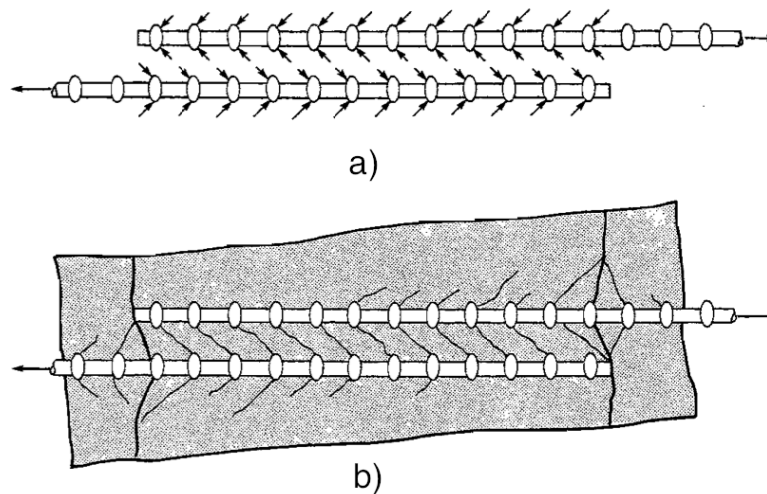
(a) Tensile lap splice stress fields in concrete around a reinforcing bar; (b) crack pattern around a tensile lap splice (MacGregor and Wight 2005)
